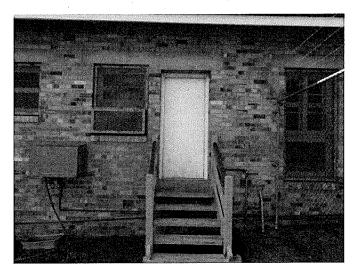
ACMA Facility main building central door, steps and external window detail south east side.
